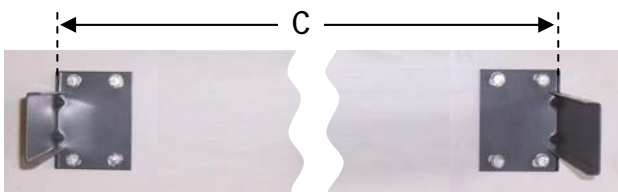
Mounting Brackets Fixed to Wall or Fascia
